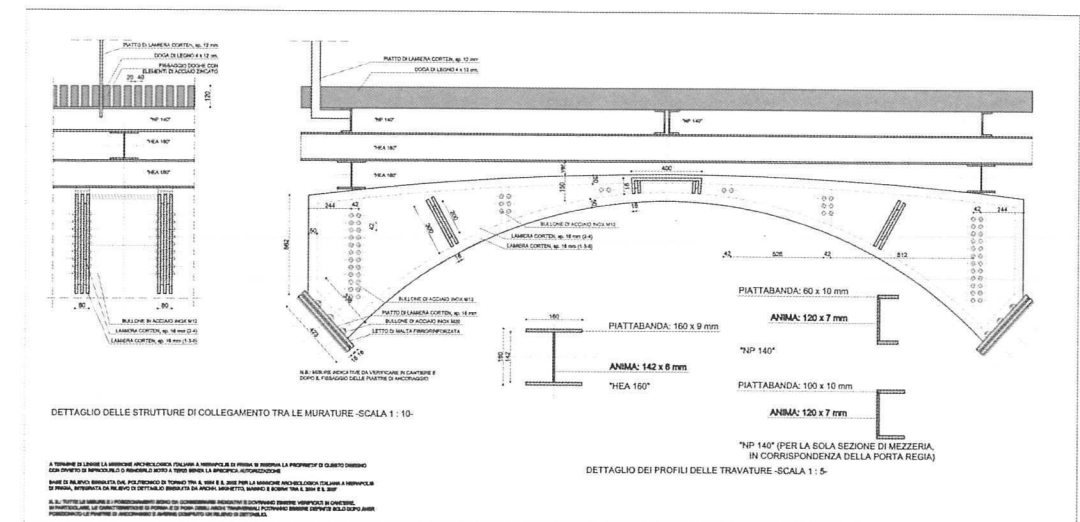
Inner-outer *scaenae* building walls connection system (Paolo Mighetto, Franco Galvagno)
